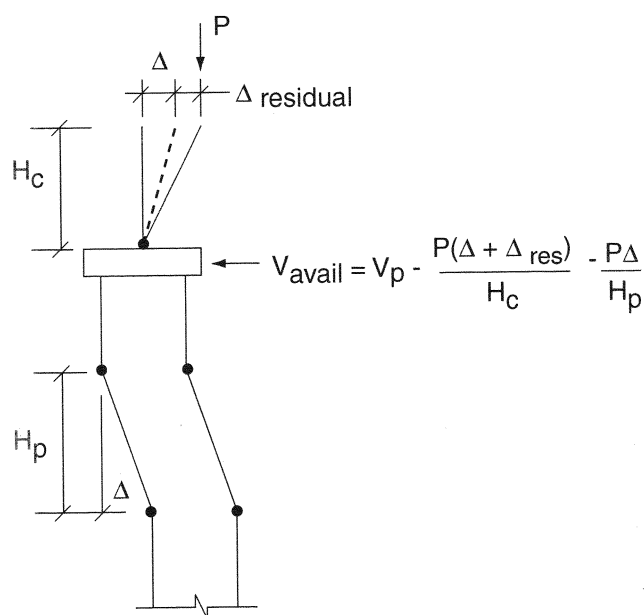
Plastic Mechanism for a Pier with Piles and an Integral or Pinned Connection to the Superstructure
